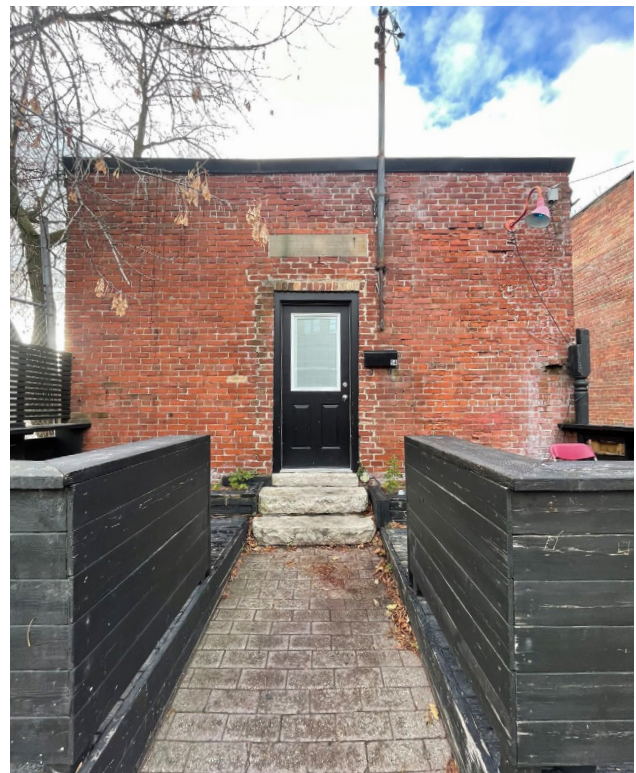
East (principal) facade, masonry in fair to poor condition.
